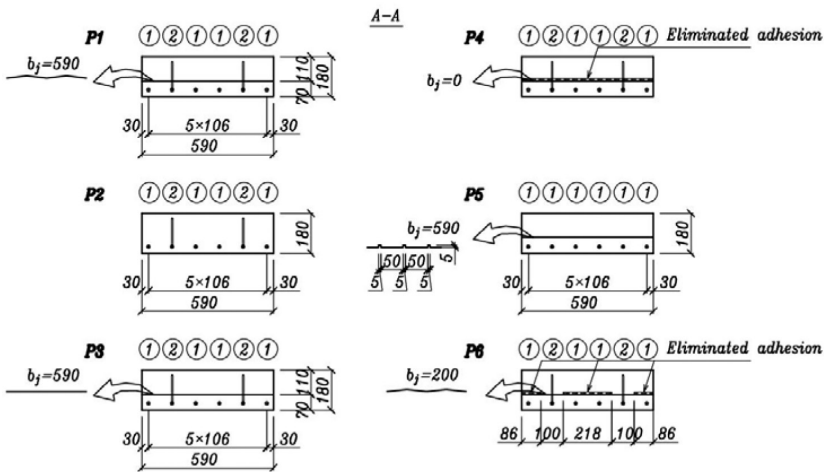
Cross-sections of tested slabs, b_j – width of interface
